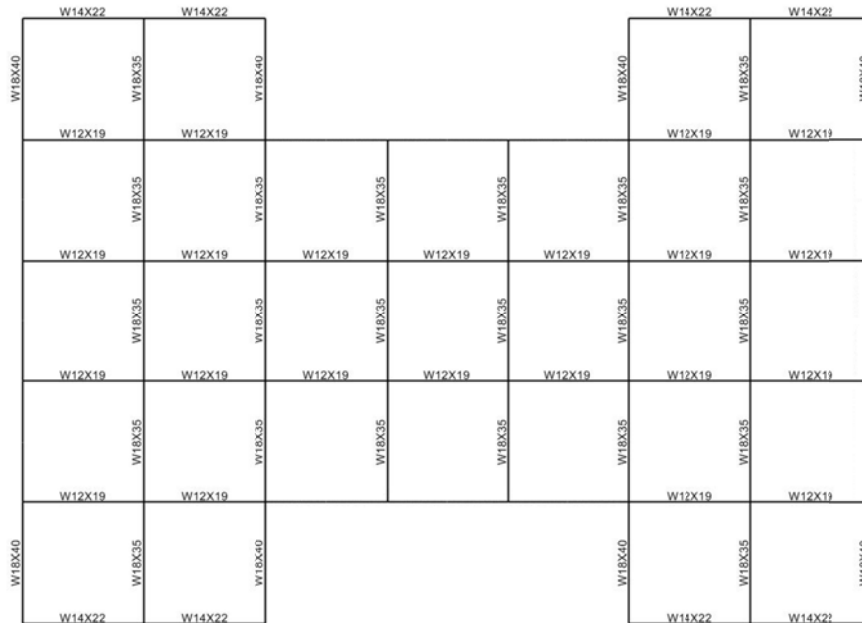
Plan View – 3<sup>rd</sup> floor
